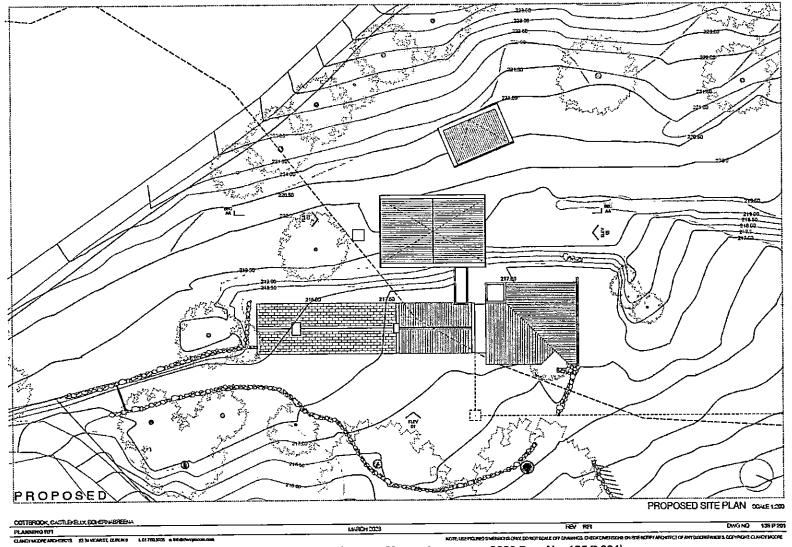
PROPOSED SITE LAYOUT (CLANCY MOORE ATCHITECTS, 2023 DRg. No. 135 P 201).
